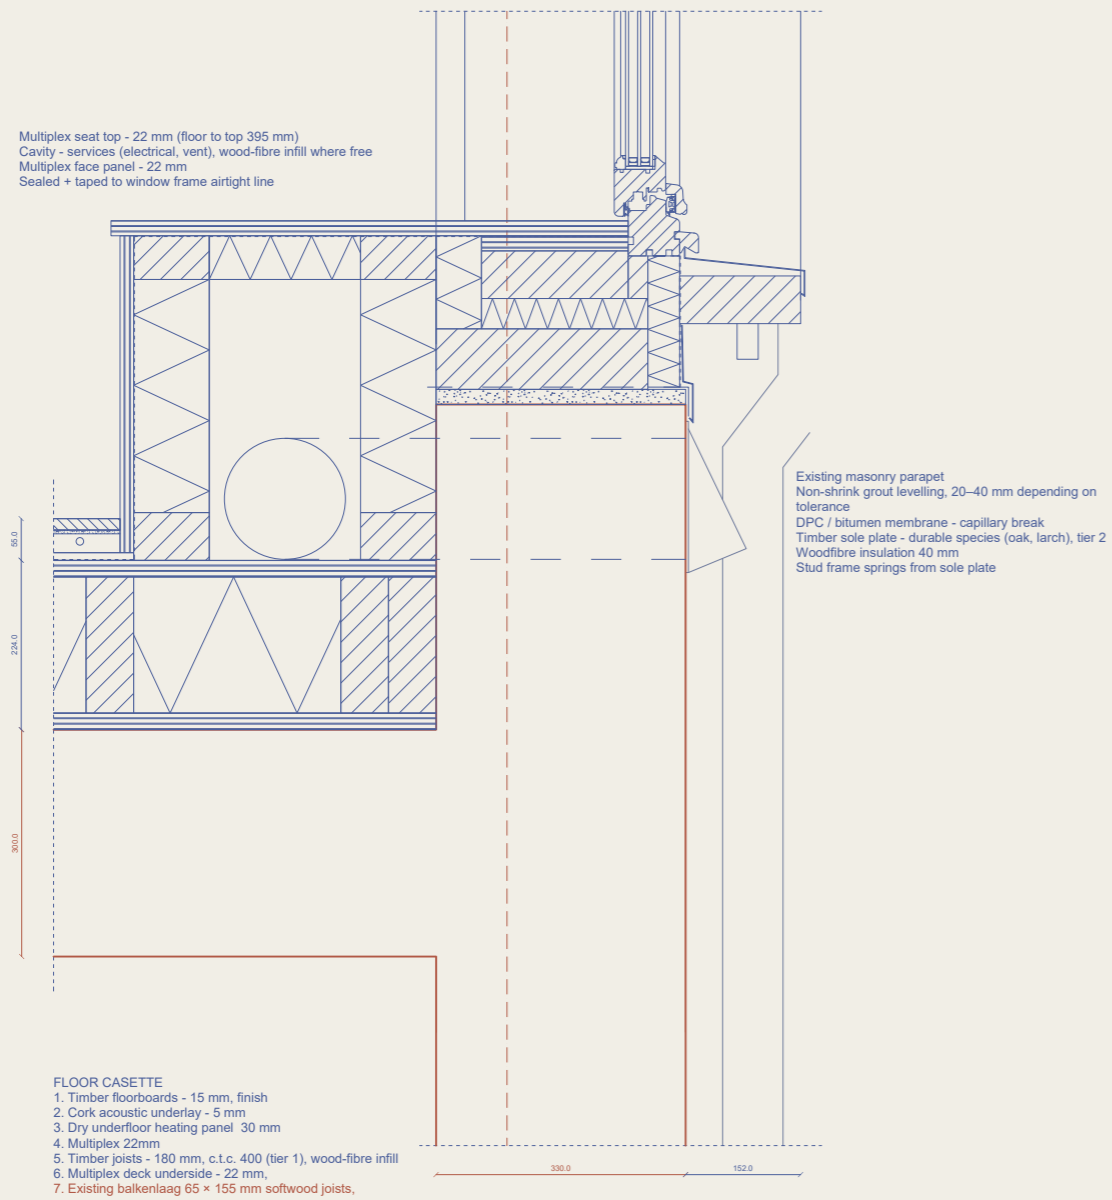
Vertical Detail new structure on top of existing 1:5, scaled to 1:10. Own work.
